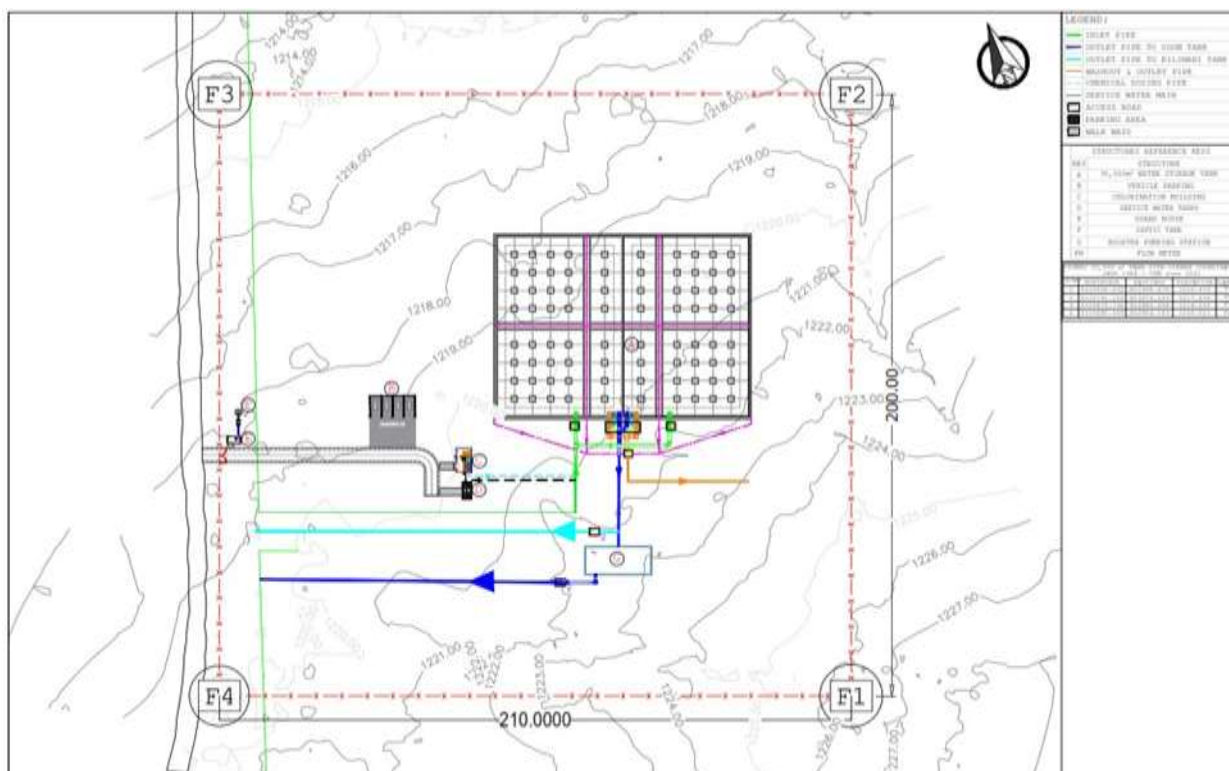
Zamahero Storage Tank - Site Layout of 1,000 m<sup>3</sup> Reservoir
